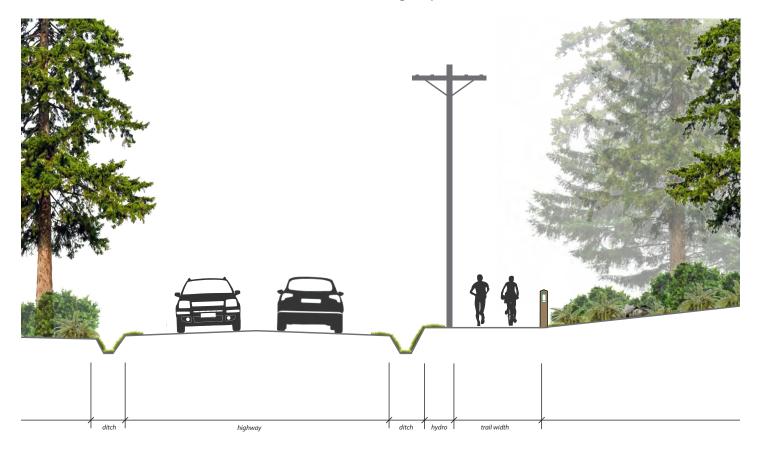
Highway, arterial and collector trail cross-section represented along the Sunshine Coast Highway (Halfmoon Bay)
